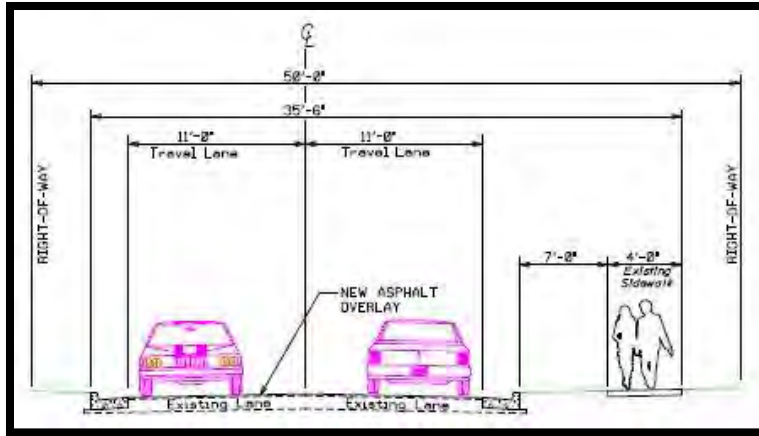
Proposed Typical Section – Alternative 4 – Hook St. from North Commons to Douglas St.
